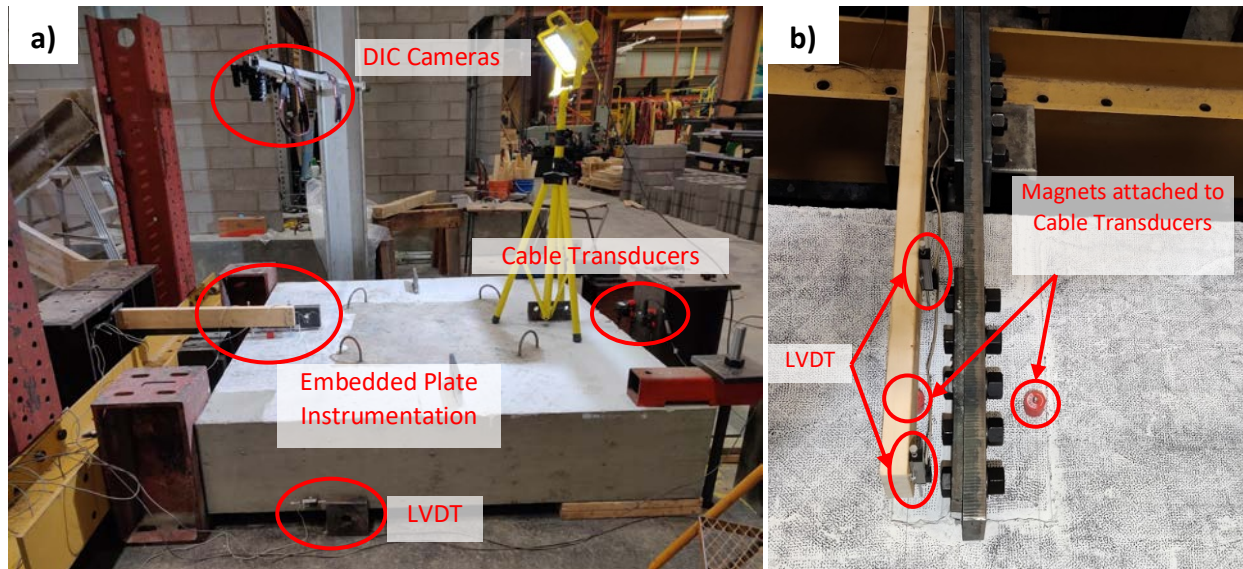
Instrumentation layout (a) of the concrete specimen and, (b) closeup at the embedded plate
